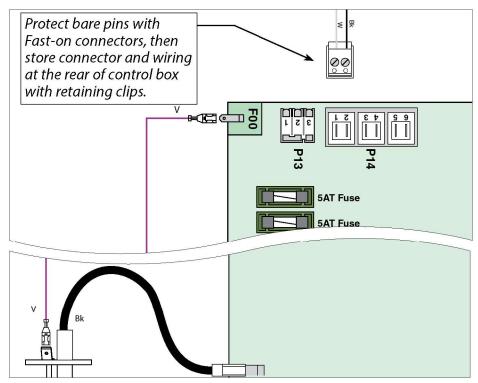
Prestige Solo & Excellence- PCB Wiring - Pre modification
